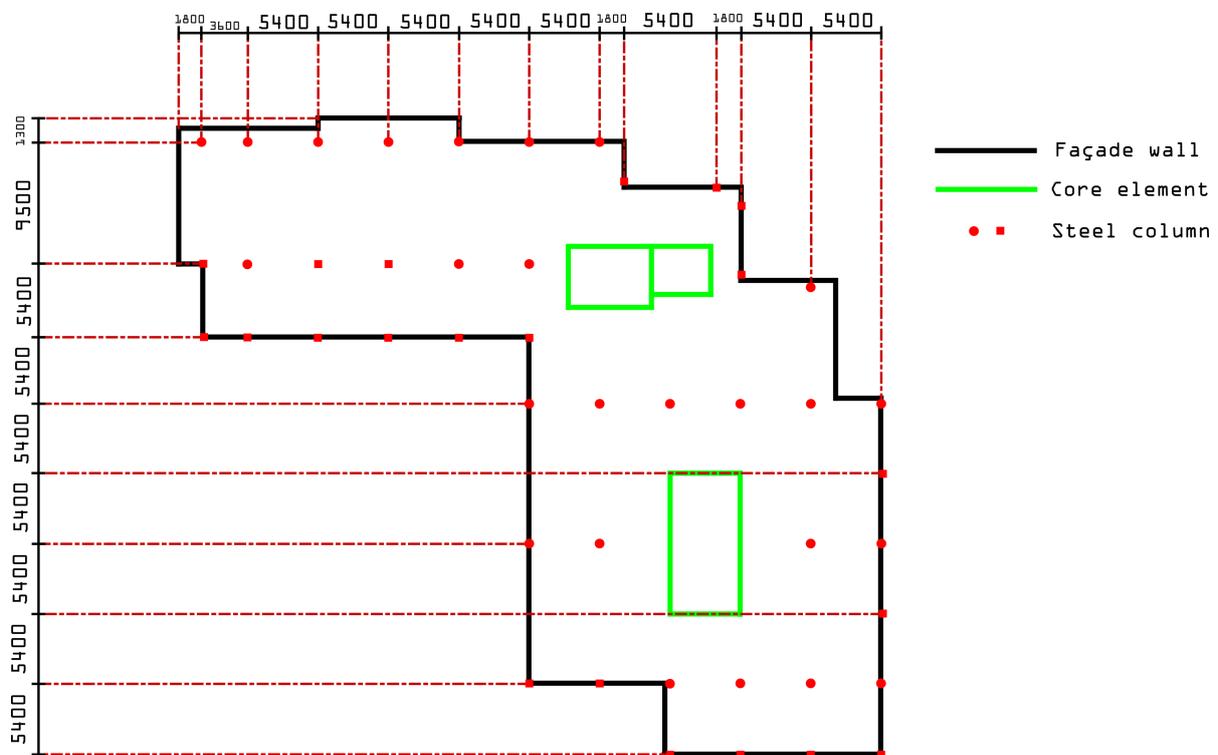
Floor Plan Apollolaan 171 - First Floor
